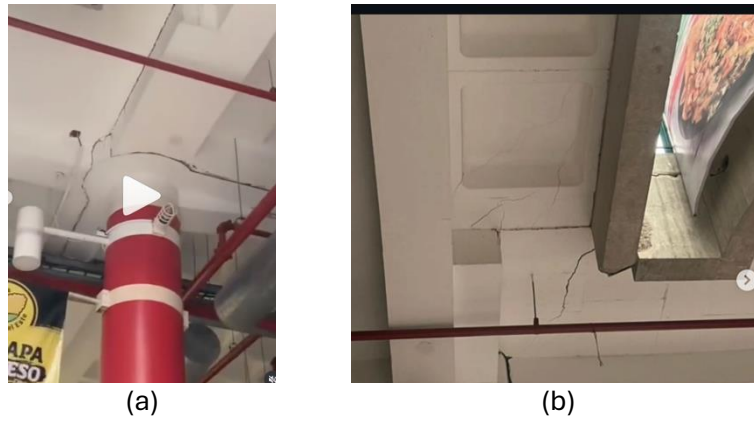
Cracking observed in a low-rise RC frame building at C.C. Metropolis, Barquisimeto: (a) beam-column joint; (b) floor interface.
